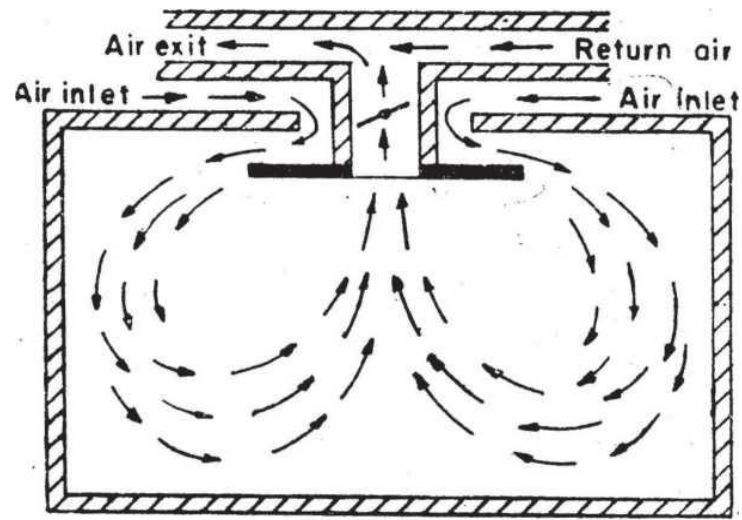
(a) Ceiling Diffuses and Side Wall Outlet
